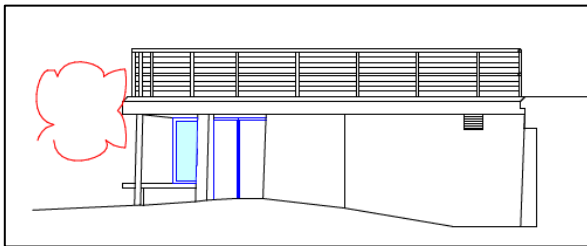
Proposed modifications to beach elevation of First Aid Facilities.
